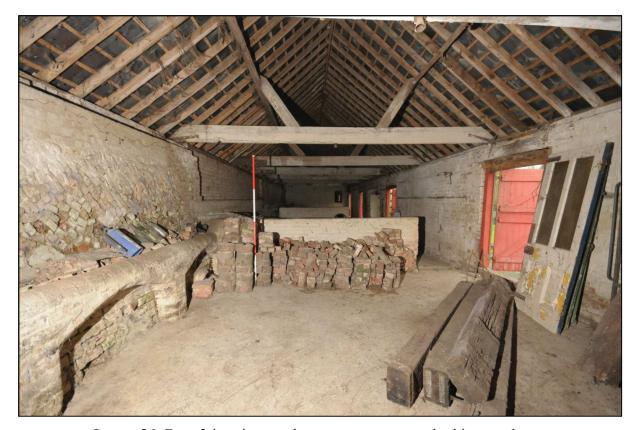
Barn 3 interior, north-west compartment, looking south-east Shows compartment from viewpoint at north-west end of building (Scale 2m)
